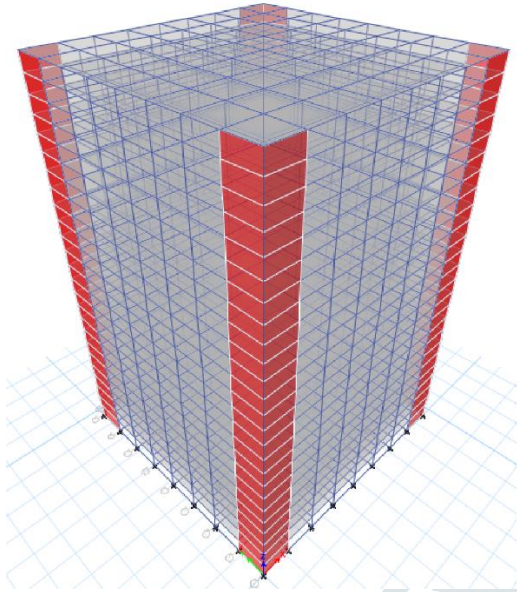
3-D view of structure with Composite shear wall provided at corners
